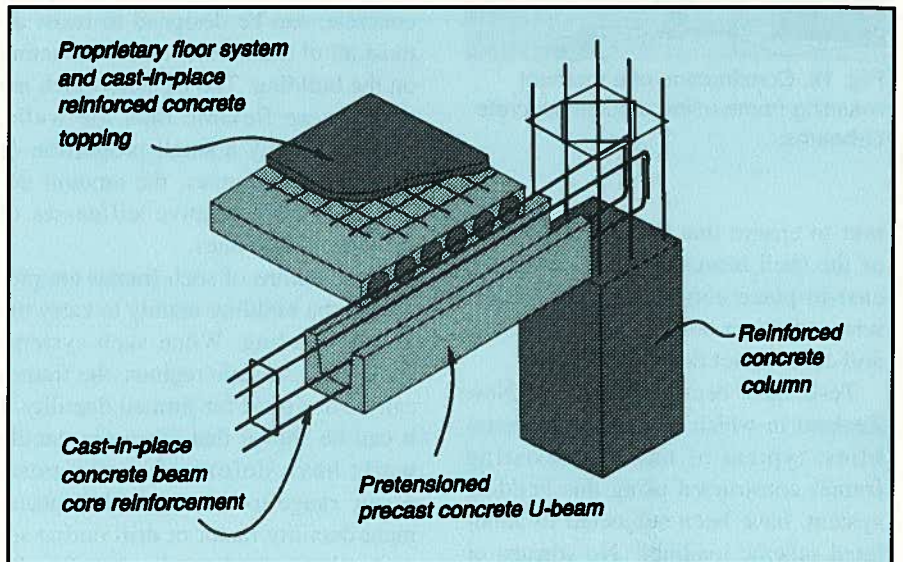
Construction details of a structural system using precast, prestressed concrete U-beams and cast-in-place reinforced concrete (Ref. 22).
